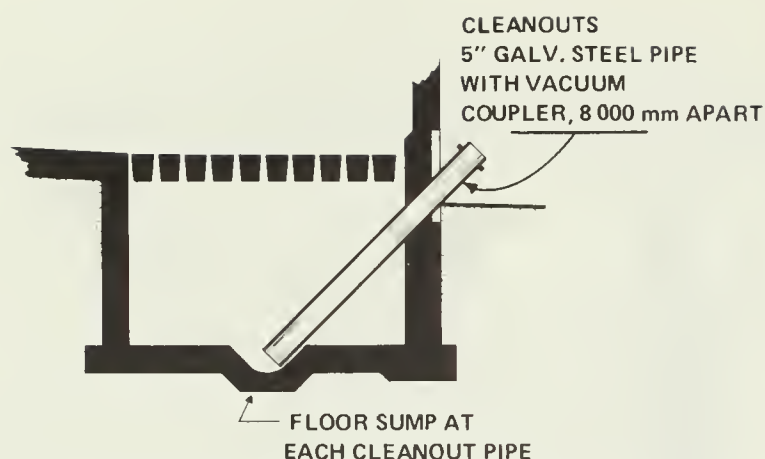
Slotted floor trench equipped for vacuum tanker cleanout.
